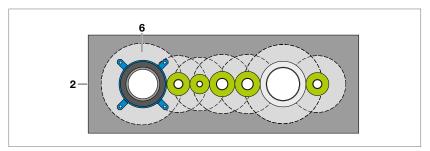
Insufficient ceiling fire bulkhead (lack of reinforcement in the dark grey area)
